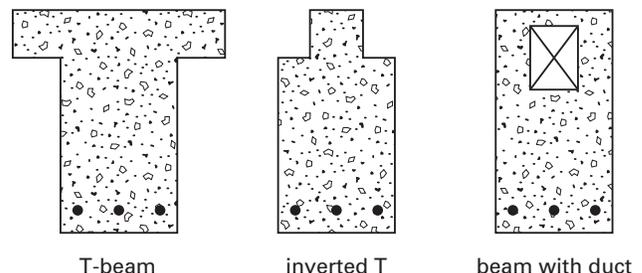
Representative Cross Sections of Irregular Reinforced Concrete Beams
